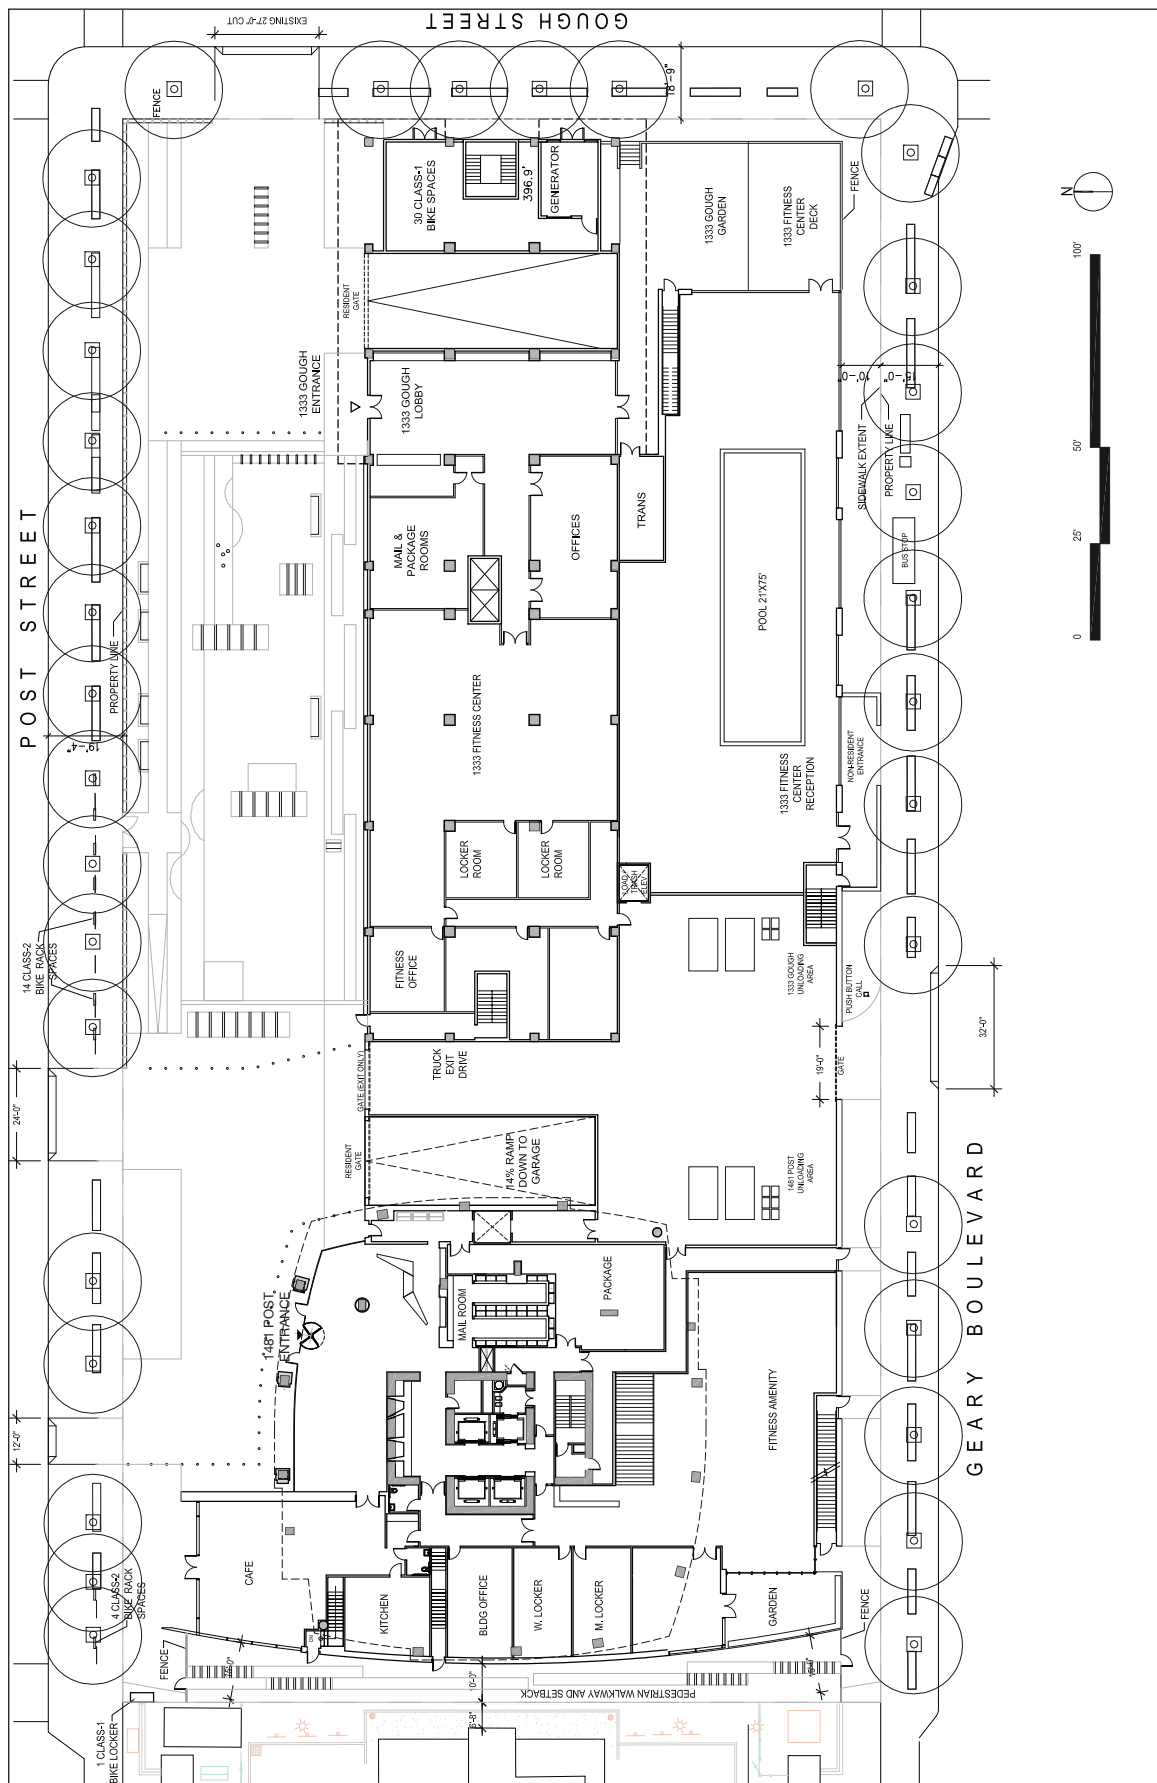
VARIANT B - 1481 POST STREET CURB CUT AND SIDEWALK WIDENING PROJECT VARIANT
